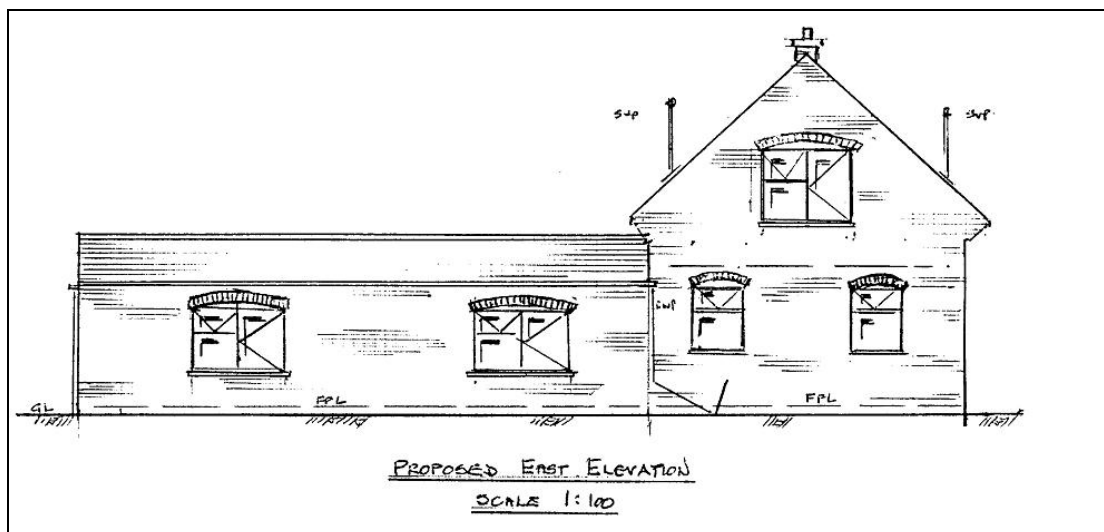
Plan of the existing & proposed east elevation (supplied by client)
